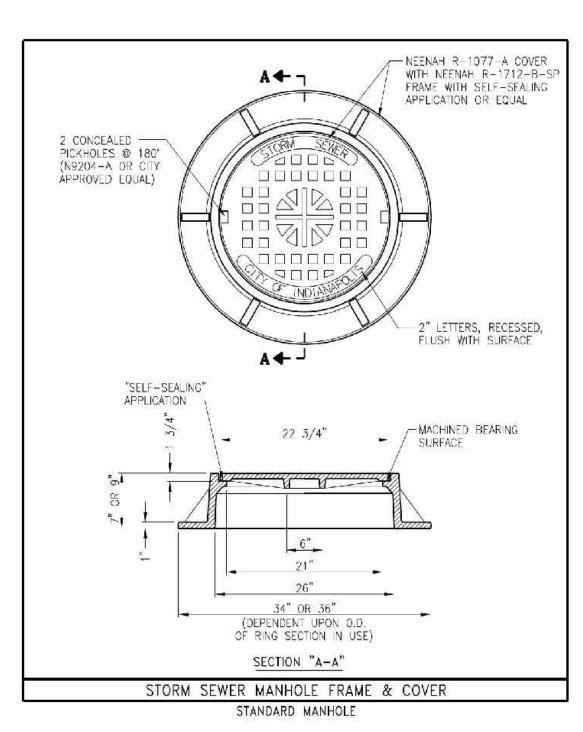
Storm Sewer Manhole Frame & Cover
